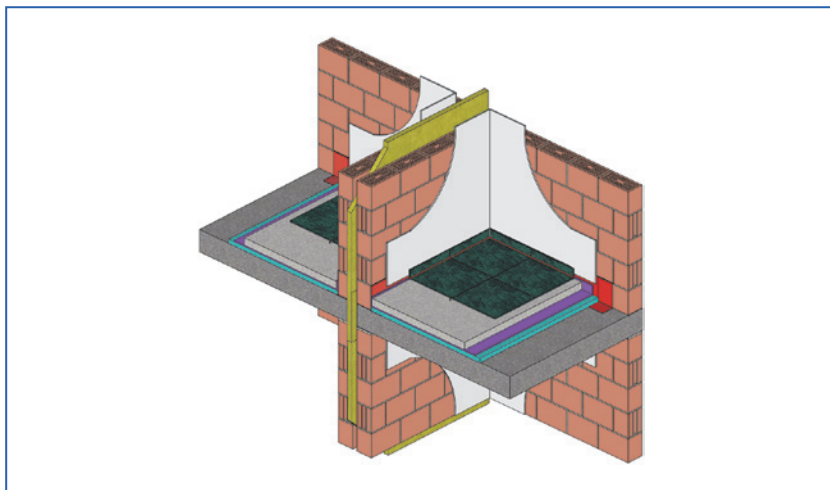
Building with interrupted floor slabs and masonry cavity separating wall. [[2] - (Belgium)].
